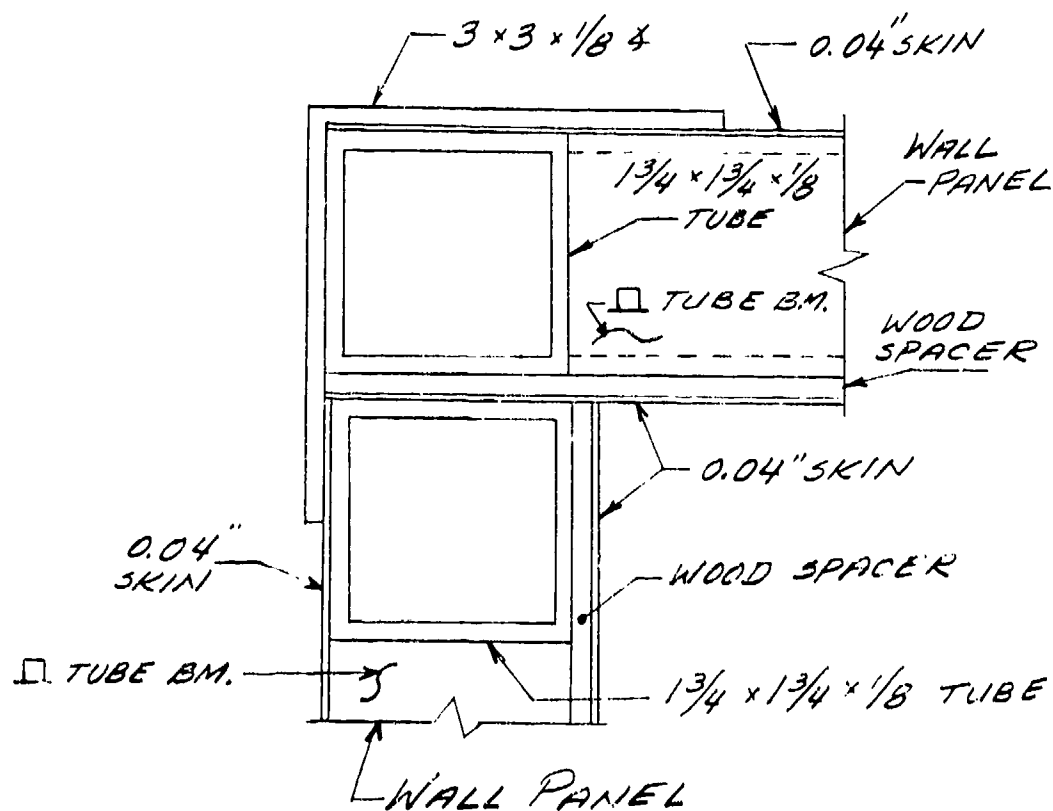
Wall to Wall and Unreinforced Roof to Wall Joint
